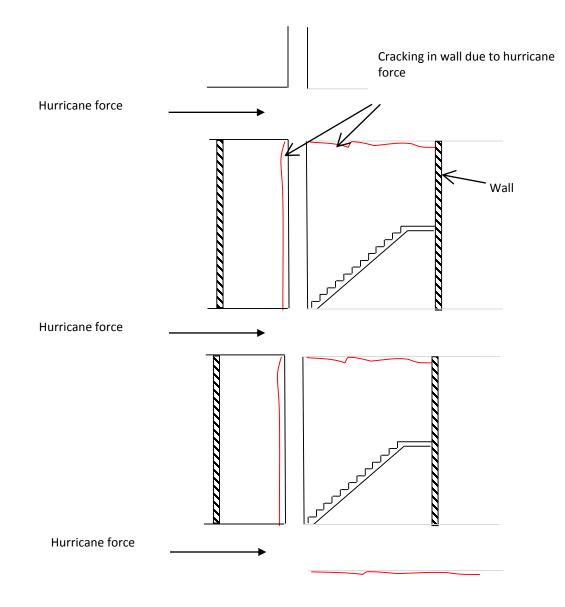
CRACK FORMATION IN IN-FILLED MASONRY WALLS
